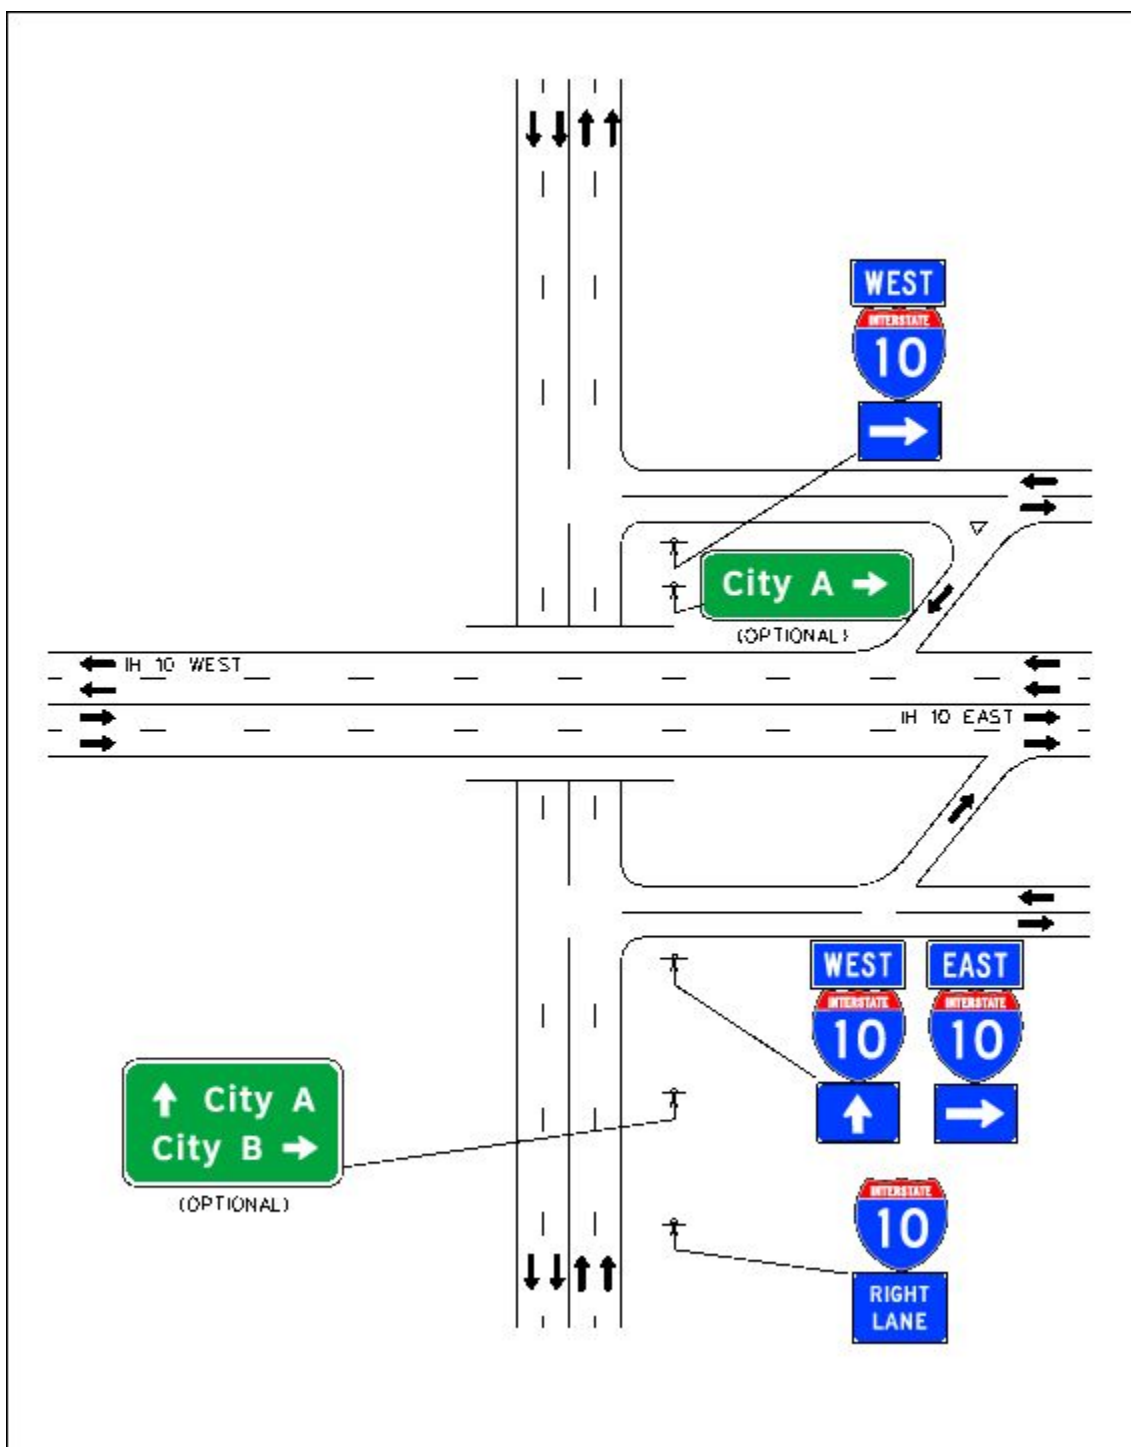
Cross-street route signing for left-direction entrance ramp located on the far-right frontage road and right-direction entrance ramp located on near-right frontage road.
